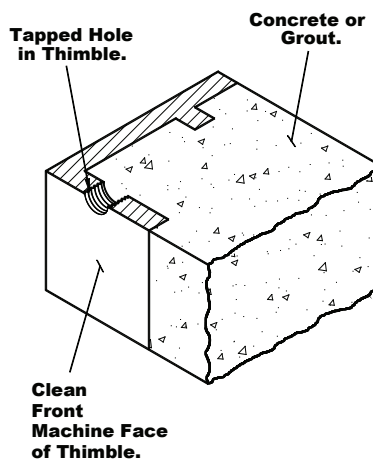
Front Cross Section of Thimble Showing Machined Front Face
